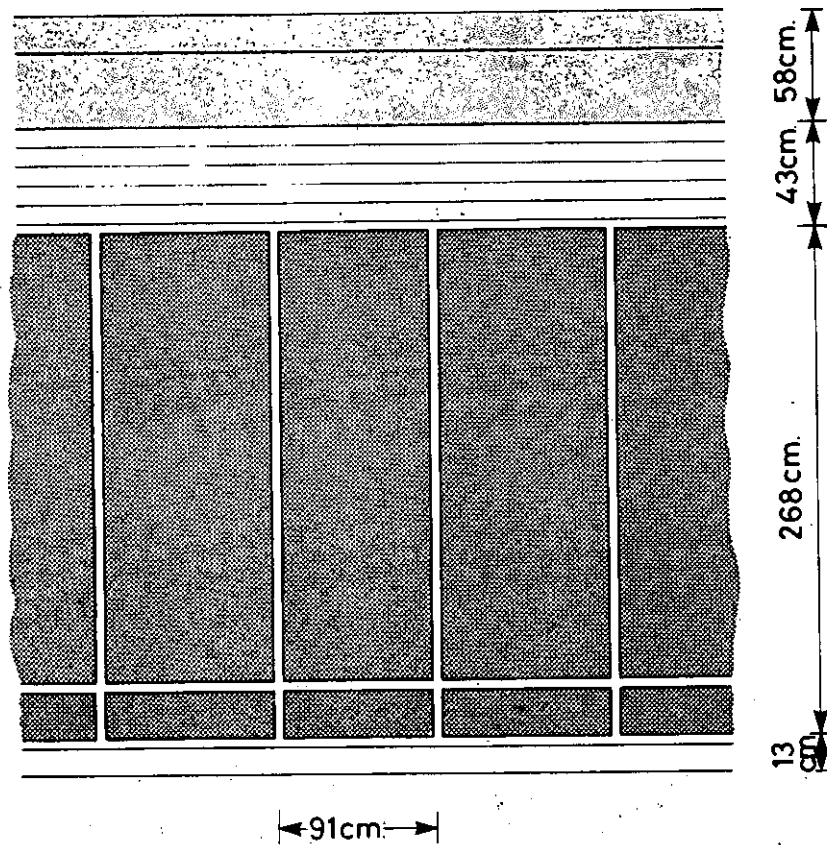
DETAIL OF EXTERNAL FACADE (CONFERENCE ROOM)
